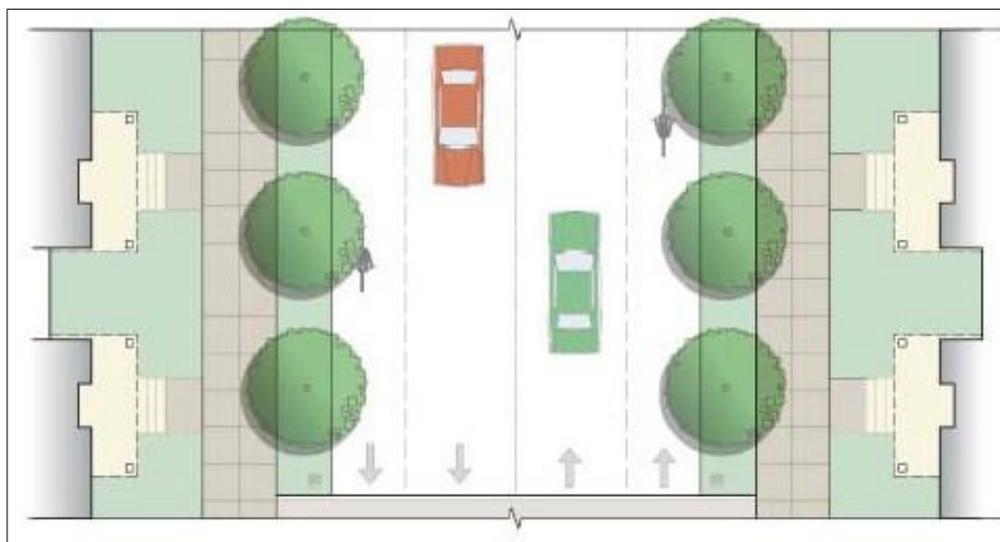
Near-Term Alternative, 34th Street Concept Plan
